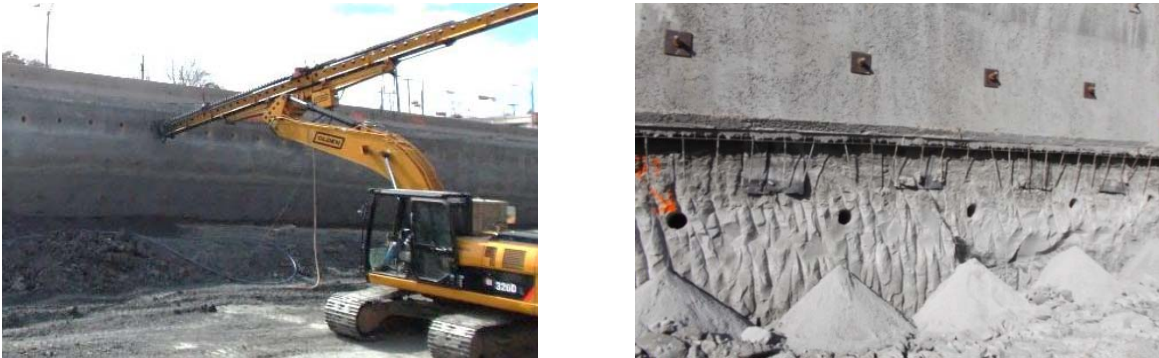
(a) Drilling operation for Tie Back and Rock Nail walls. (b) Detail of drilled holes prior to reinforcement placement and grout injection. (personal pictures archive 2013)
